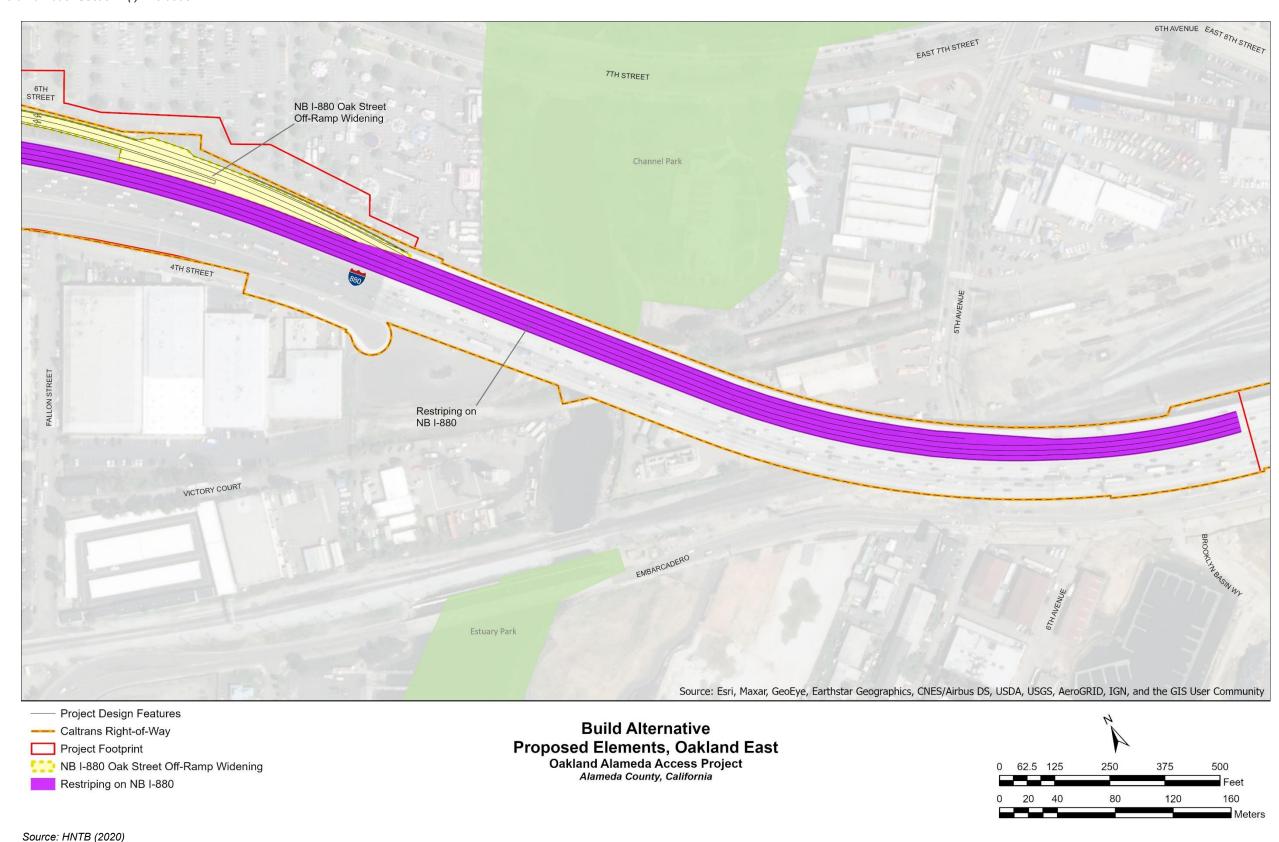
Build Alternative Proposed Elements, Oakland East
